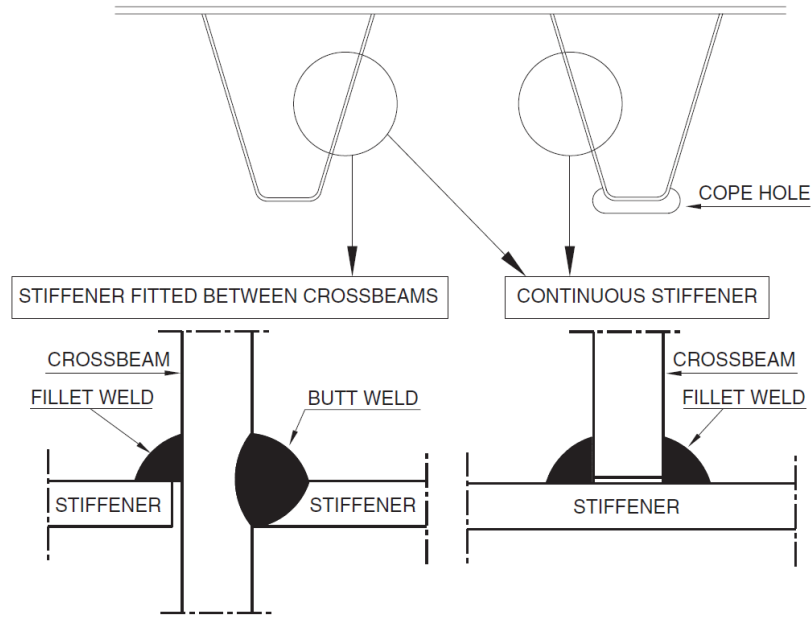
Typical geometry for rib-to-floor beam connection (Kolstein, 2007).
